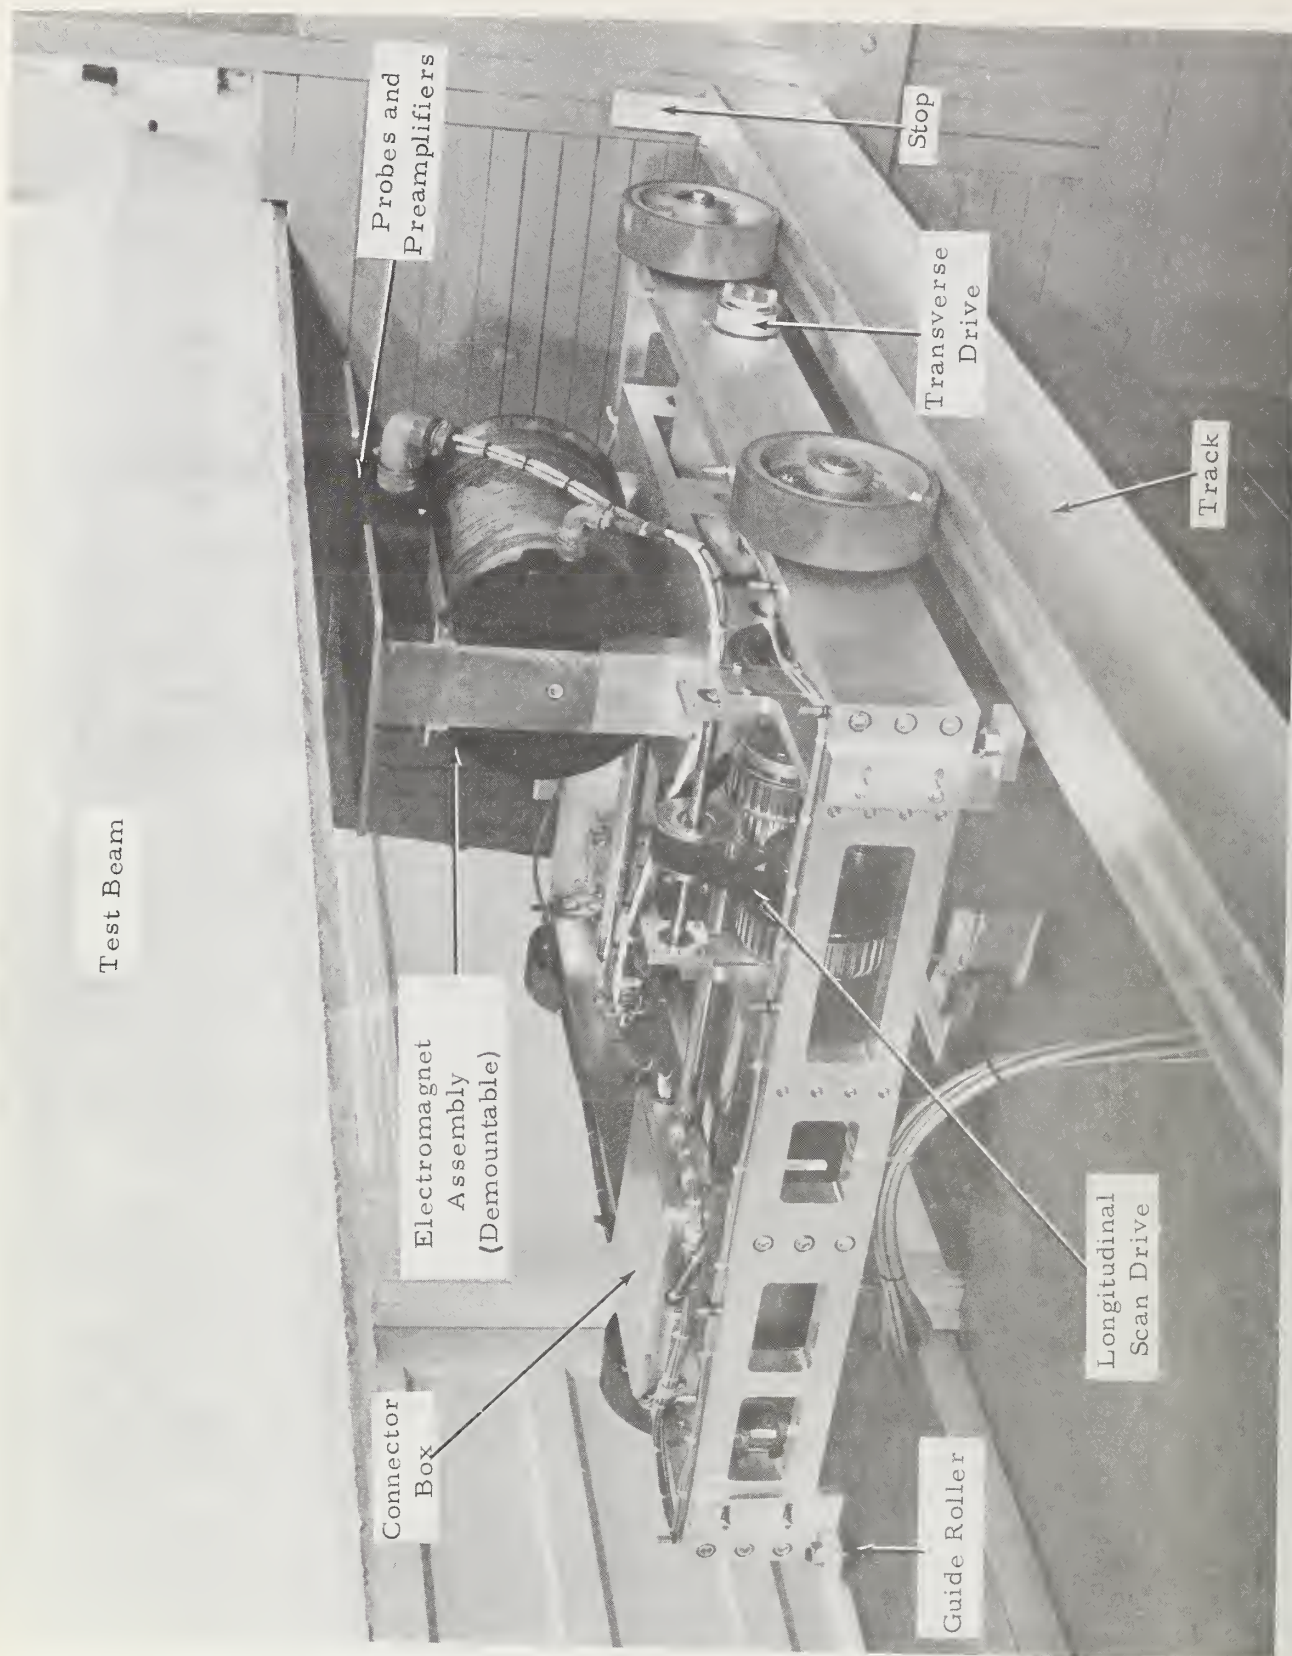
CLOSEUP VIEW OF INSPECTION CART
